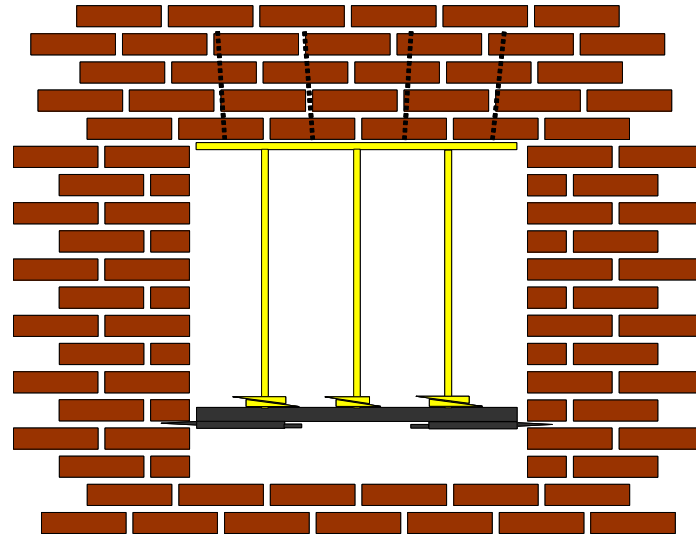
Fixture used to avoid damage on window sheets and to secure the beam from falling down.
